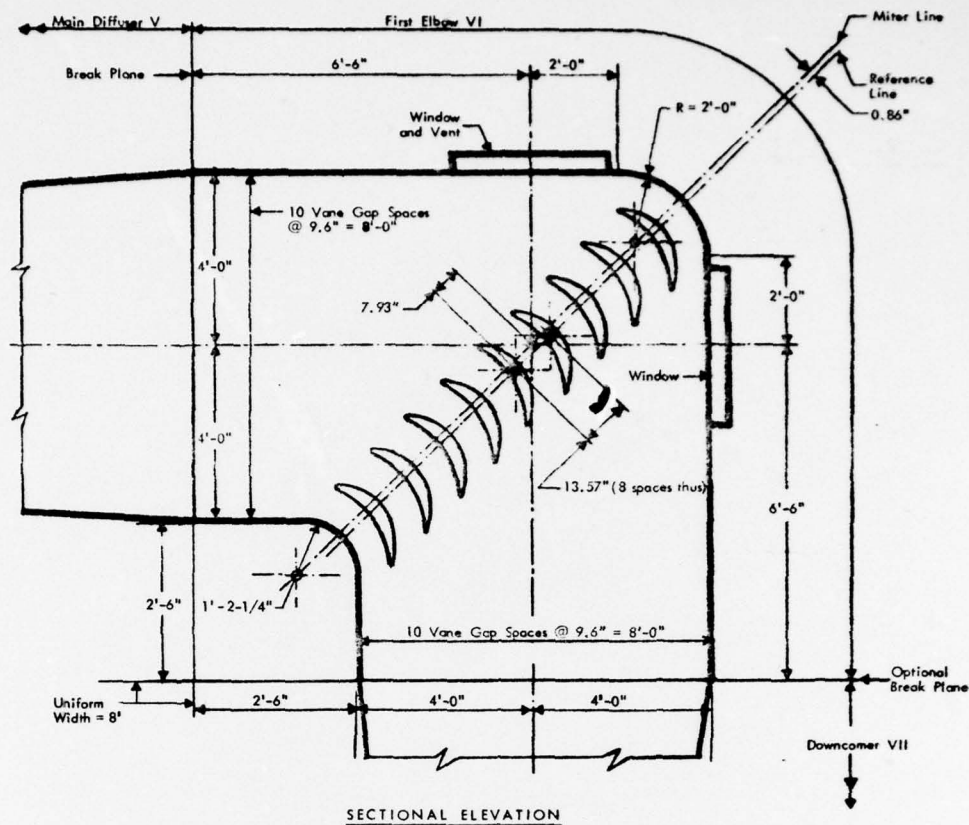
First Elbow Configuration (all dimensions relate to prototype inside flow surfaces)
